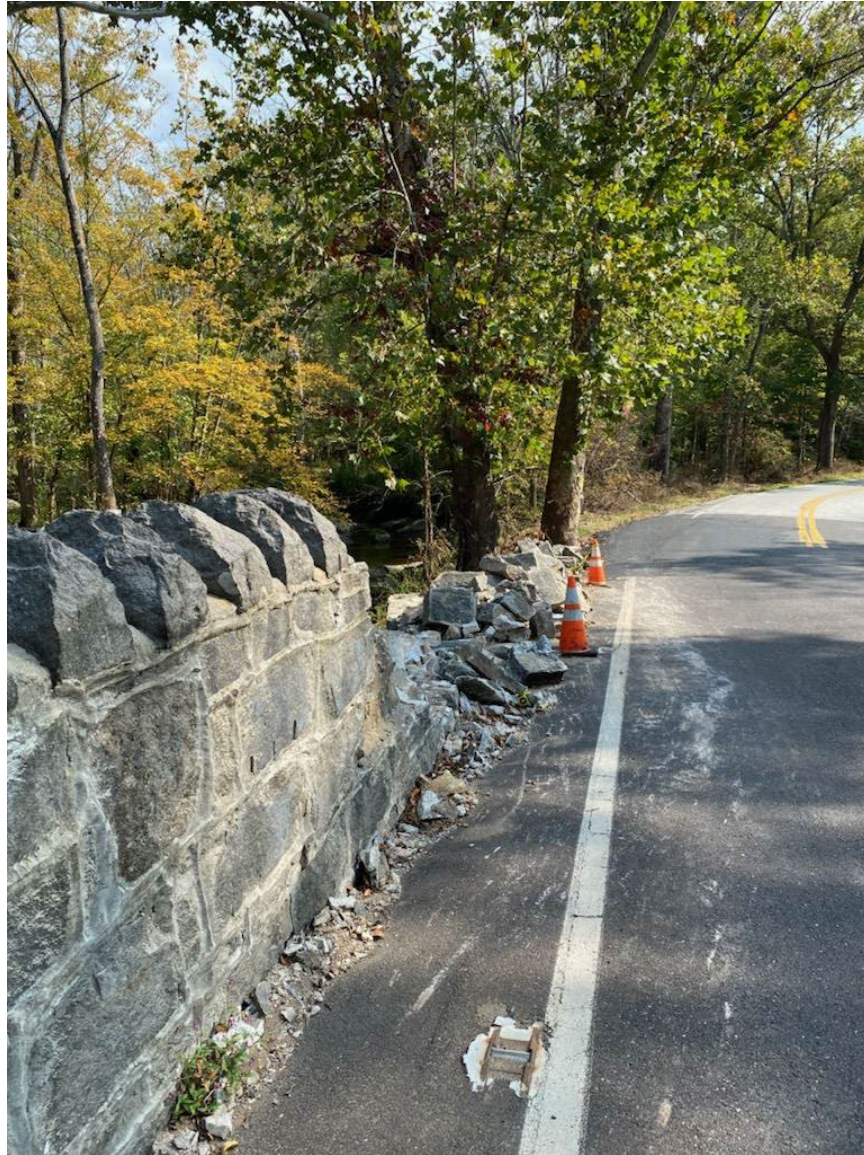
Swamp Creek Rd Bridge 2 Damage to Parapet Wall (40.367853, -75.422698).
